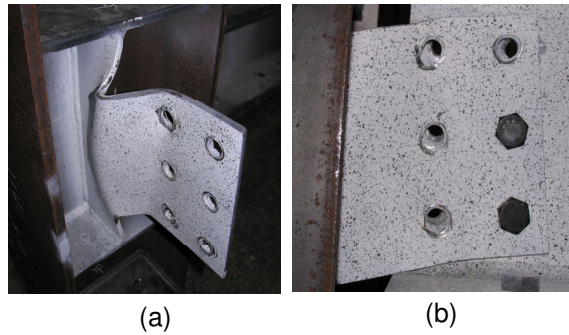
Typical stiffened EST failure modes (a) plate buckling, and (b) failure of first column of bolts
